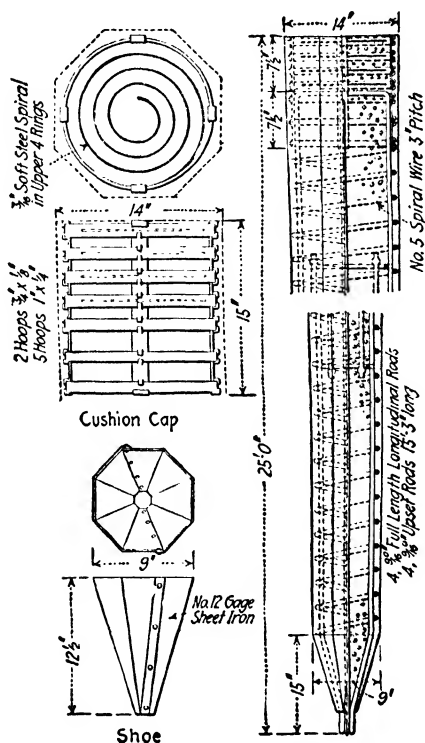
Reinforcement of Cummings Concrete Pile.
